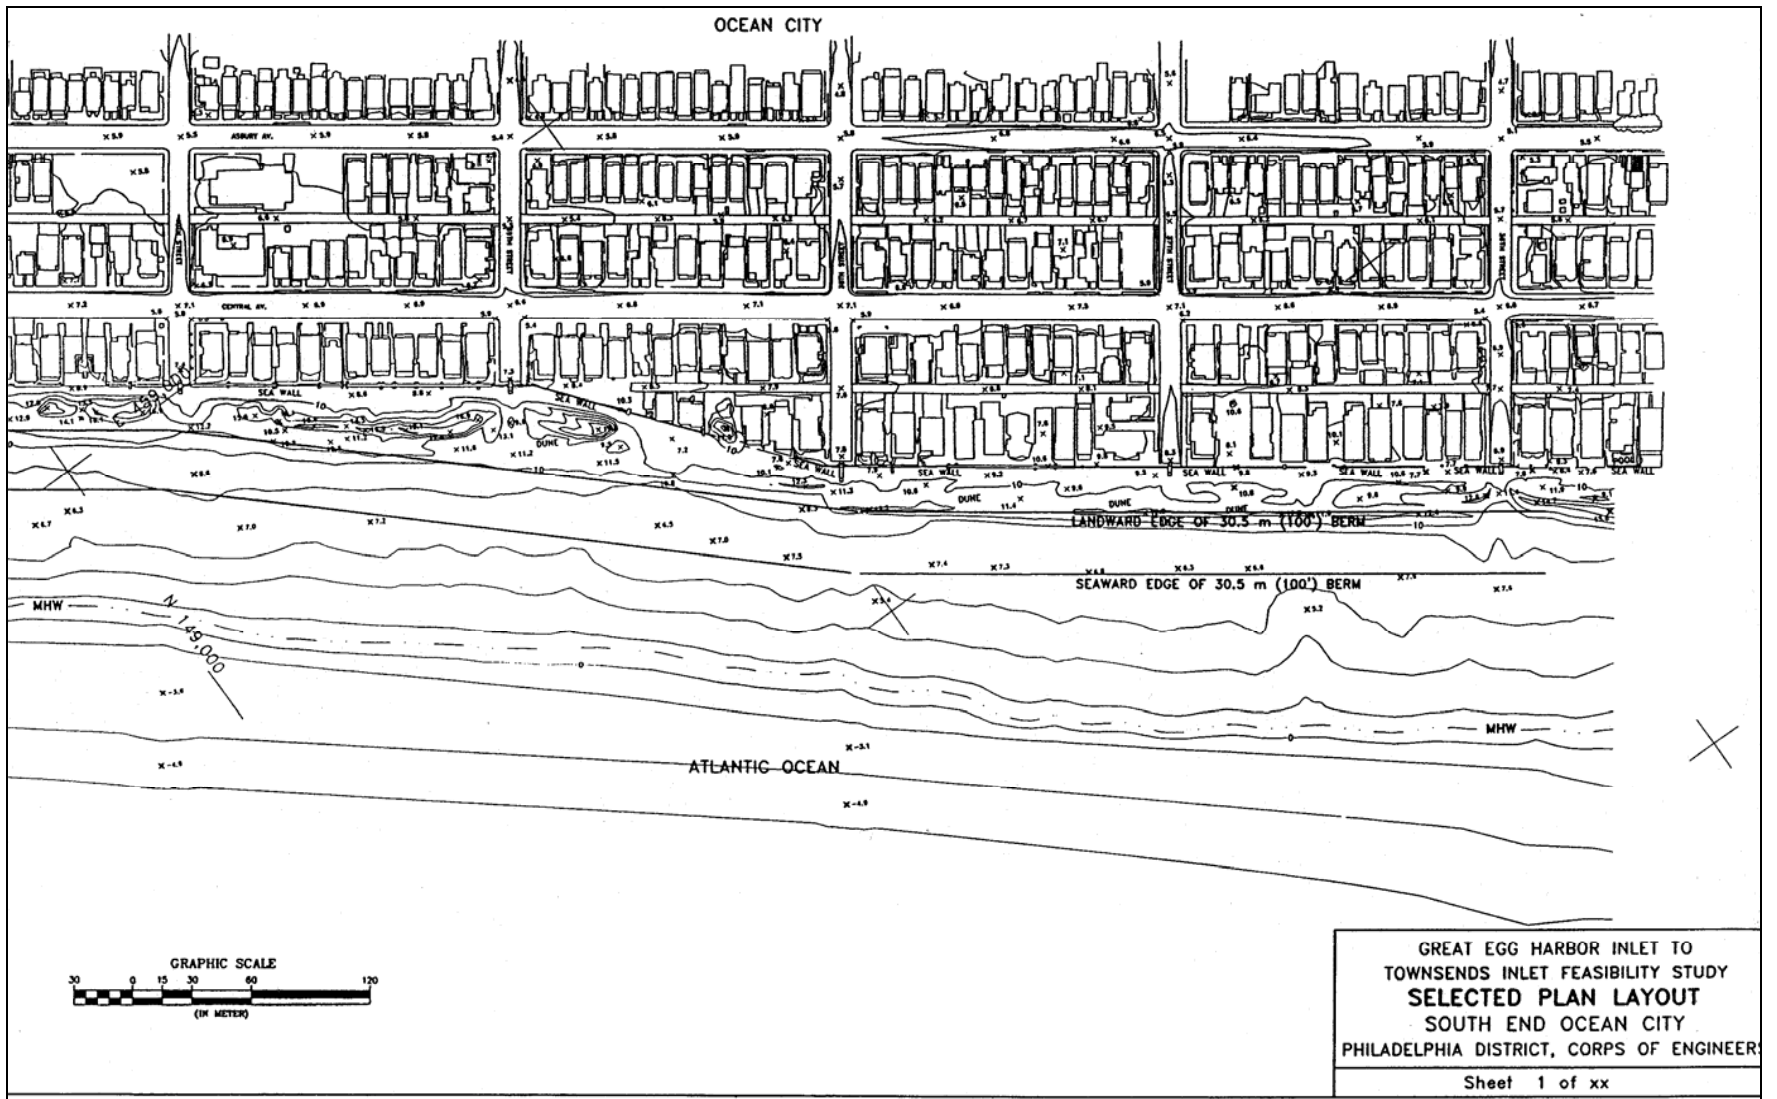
Selected Plan Layout for Ocean City, NJ – 36th Street to south of 40th Street
